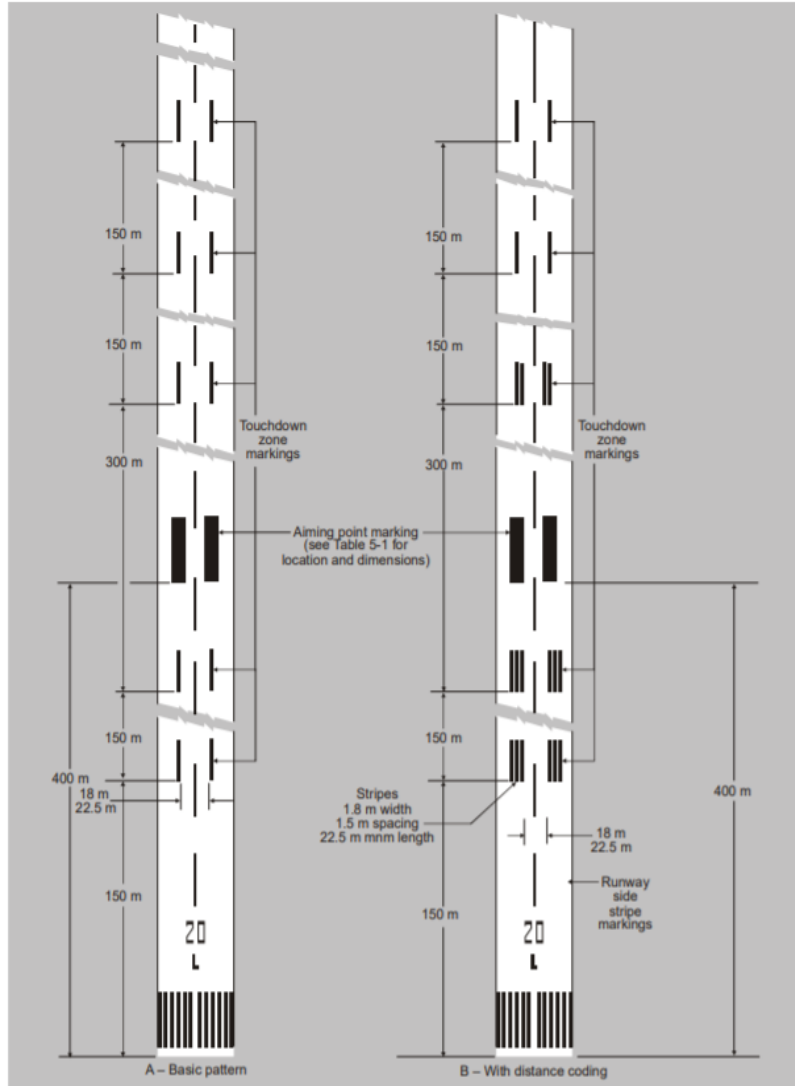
Aiming point and touchdown zone markings (illustrated for a runway with a length of 2400 m or more)
